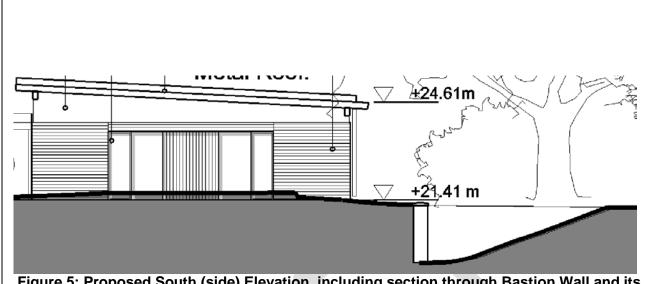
Proposed South (side) Elevation, including section through Bastion Wall and its ditch.
